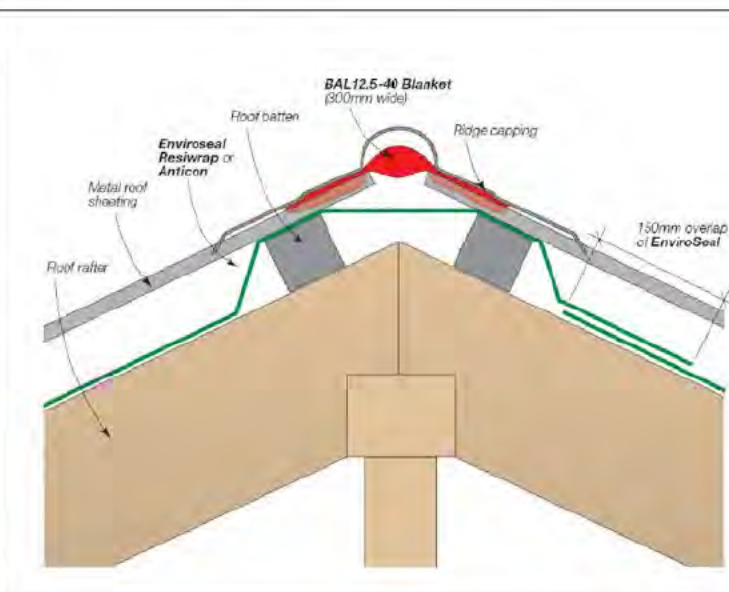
Hip/Ridge Detail – Steel Roof (BAL-12.5 – BAL-40)
